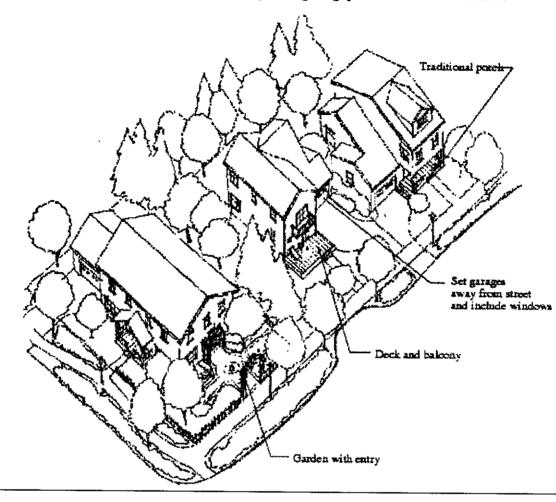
Building Orientation. Three options for providing living space oriented toward the street
